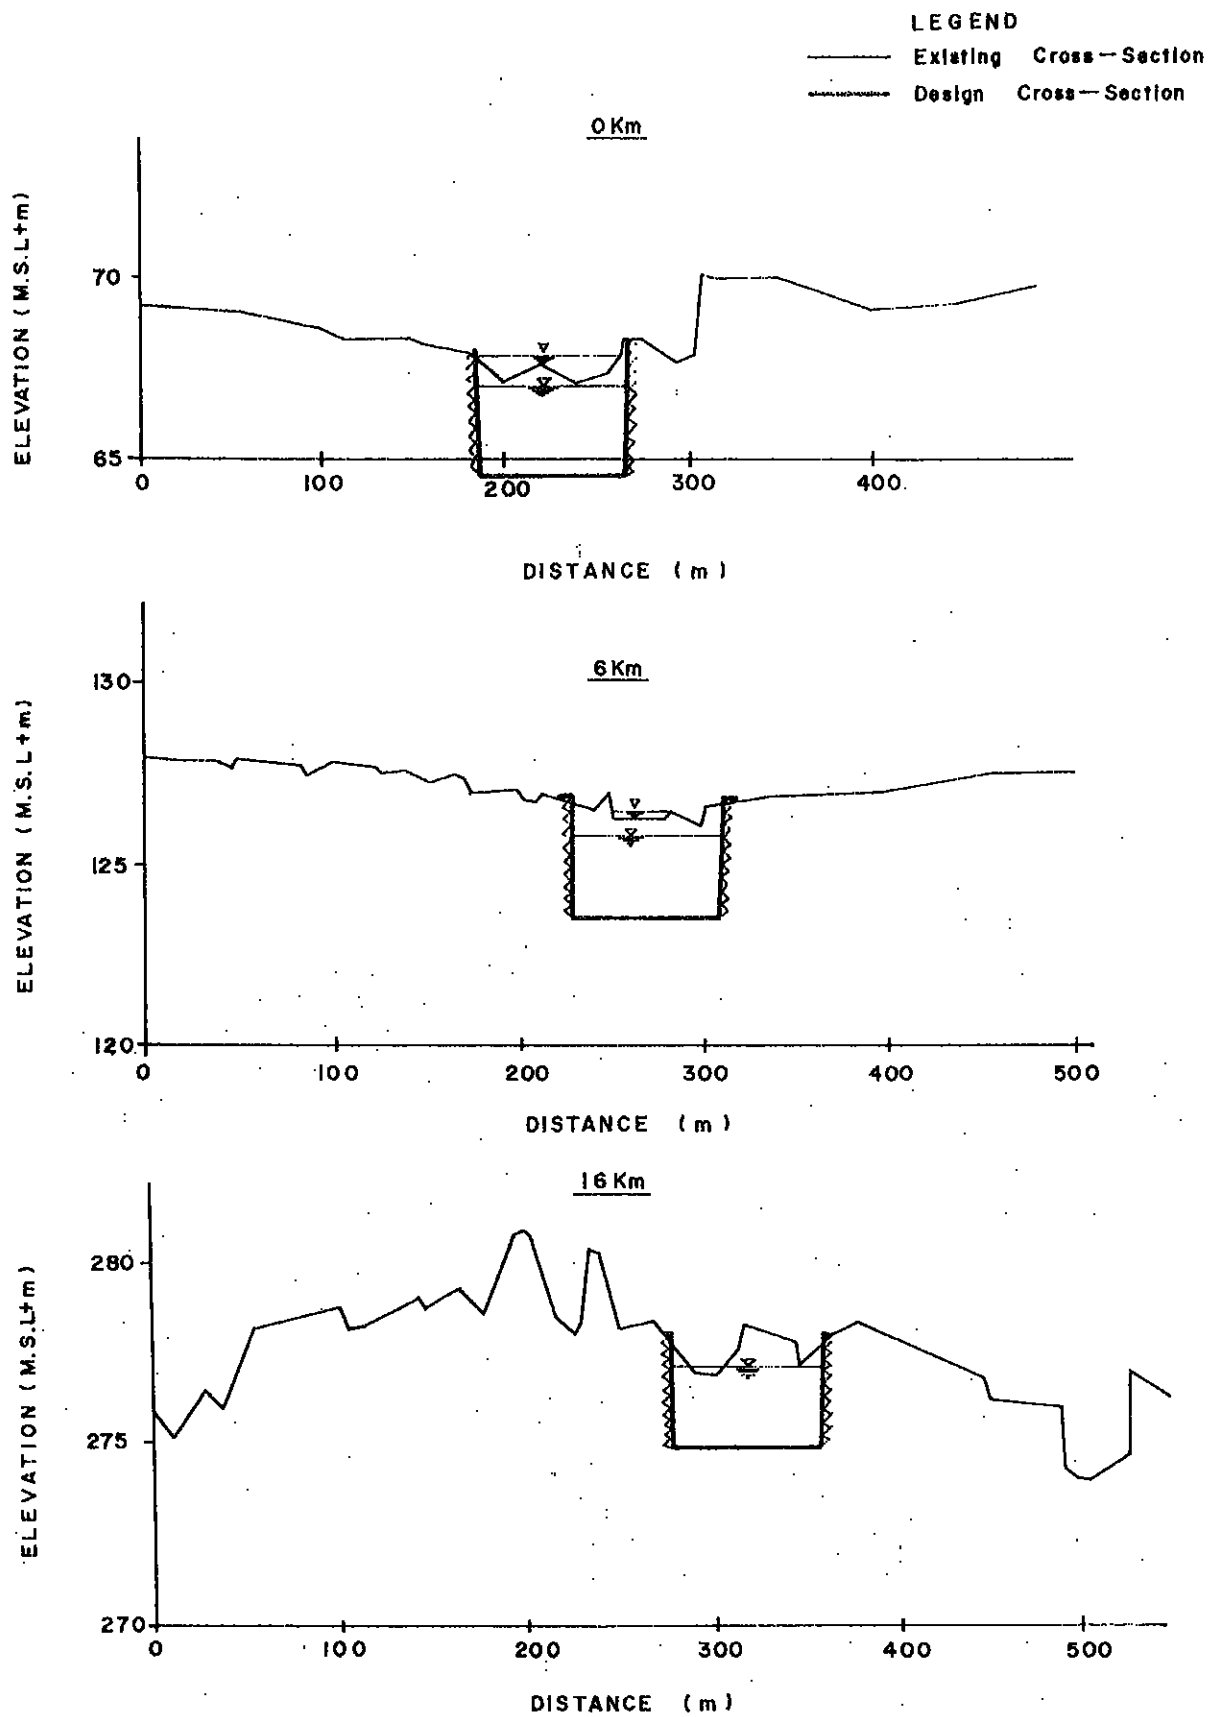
(3/4) TYPICAL CROSS SECTION (PANTALEON RIVER)
